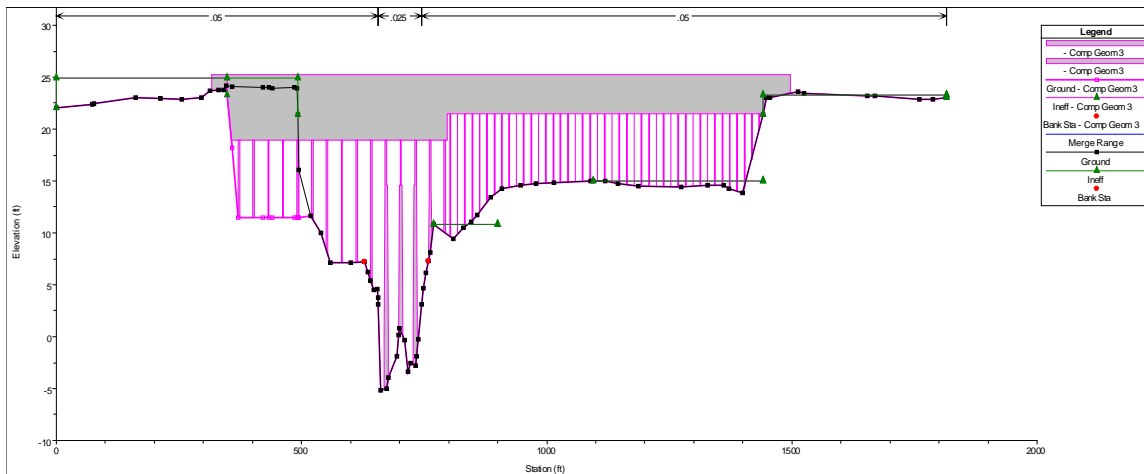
New Design for UPRR #2 Cross section 5.445 at Bridge
